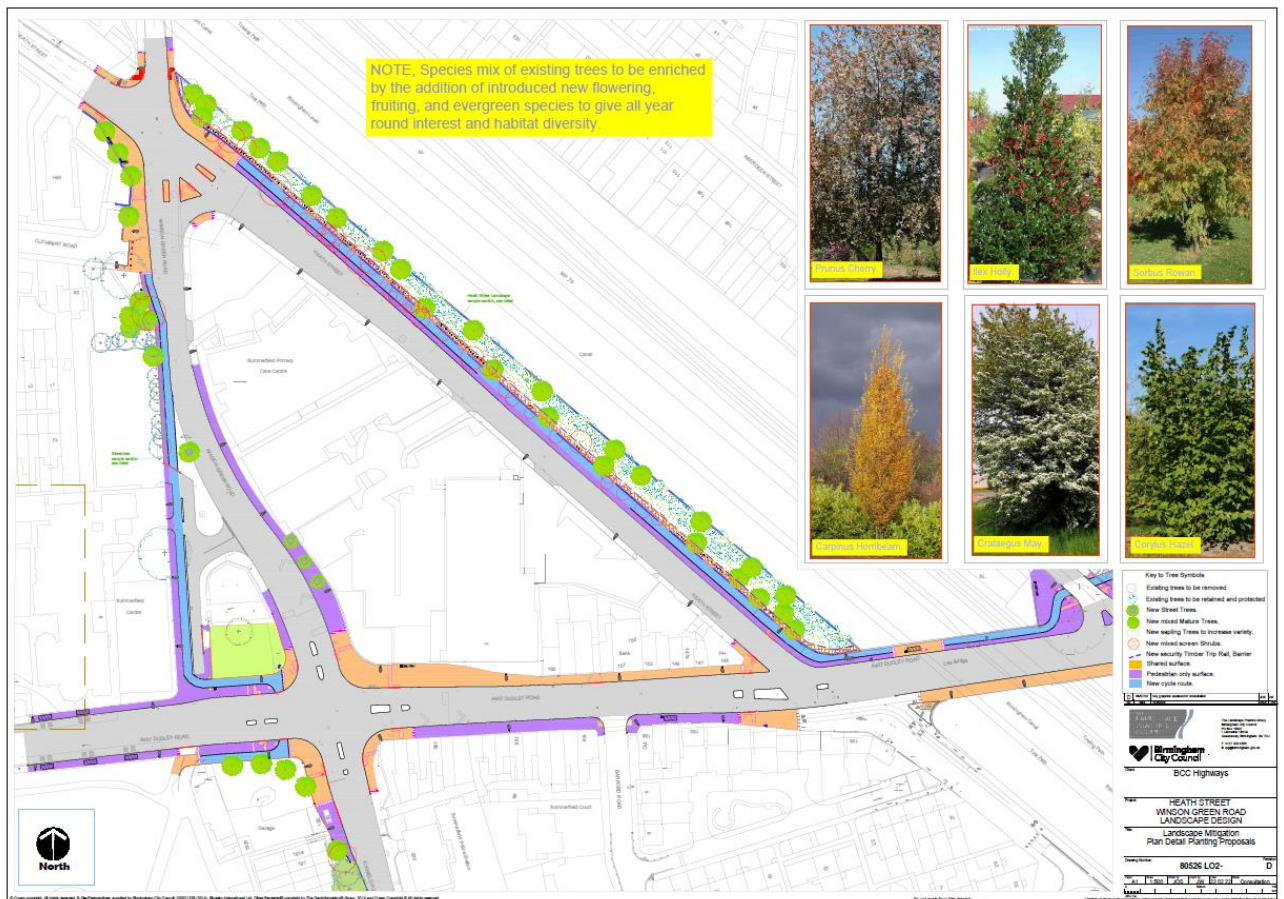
Heath Street / Winson Green Road / Icknield Port Road Landscape Design
